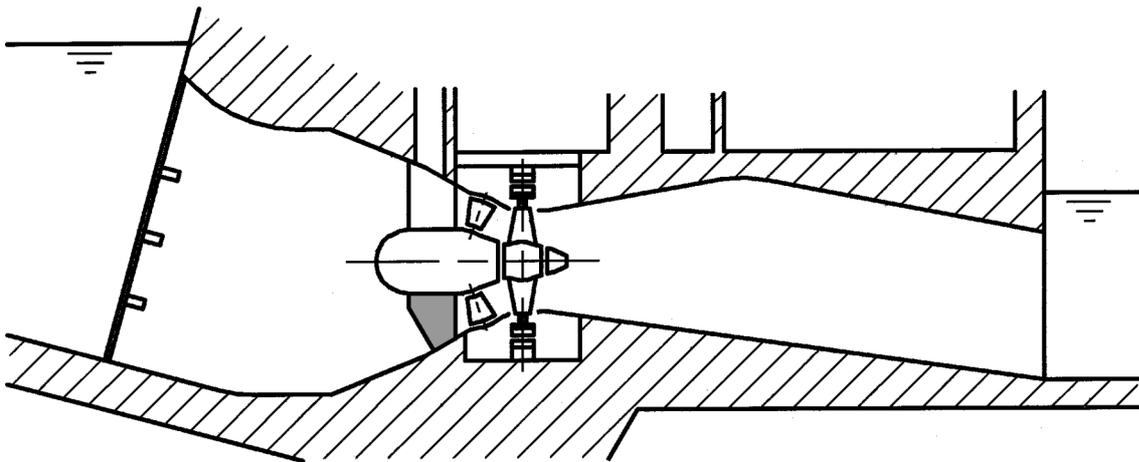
Rim-generator unit The generator rotor is directly attached to the runner periphery. The Straflo^{®1)} turbine is part of this type of unit.
